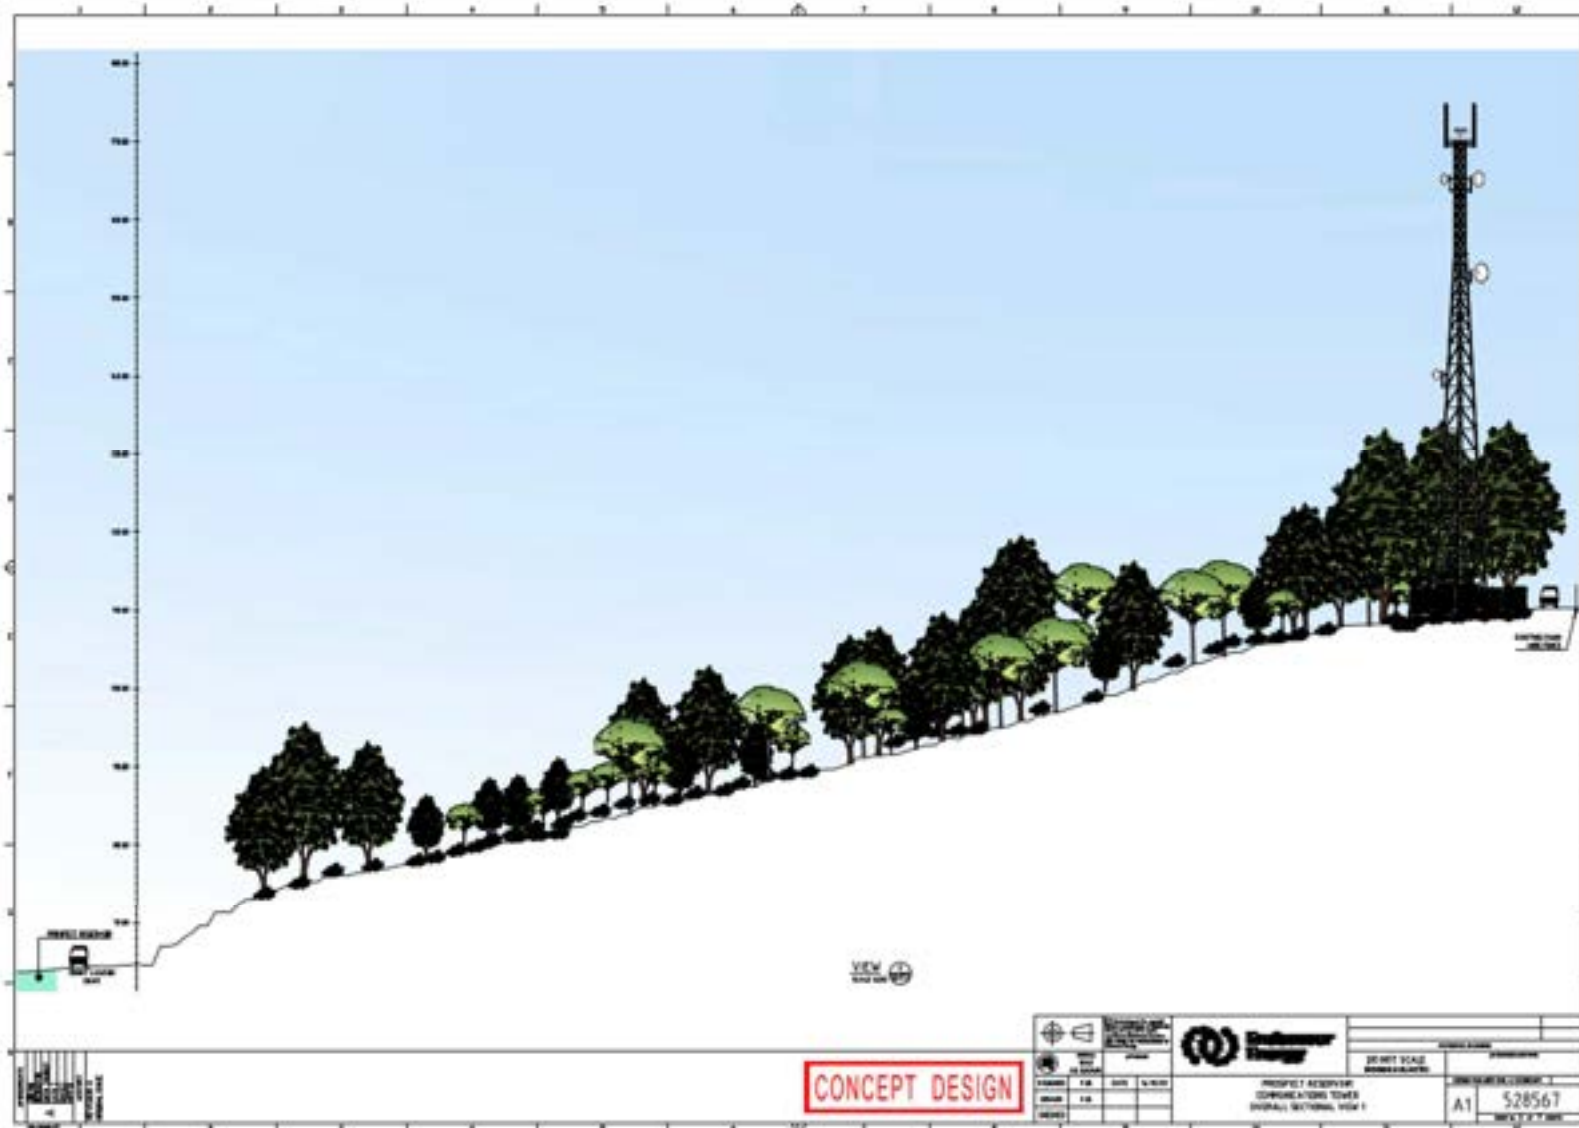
Section showing proposed tower and William Lawson Drive (refer Figure 3 for section location)
